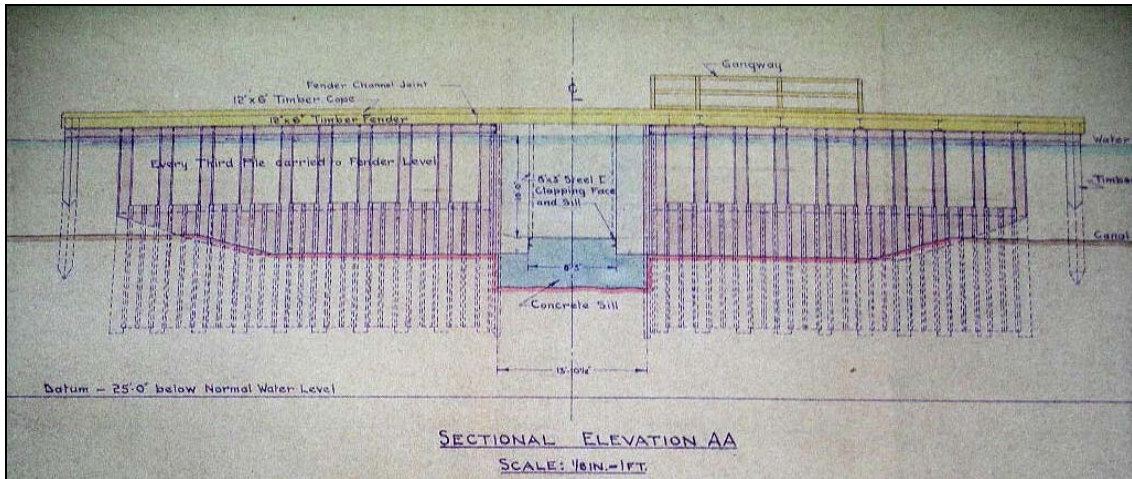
plan NAS RHP41531 showing plan of safety gates
